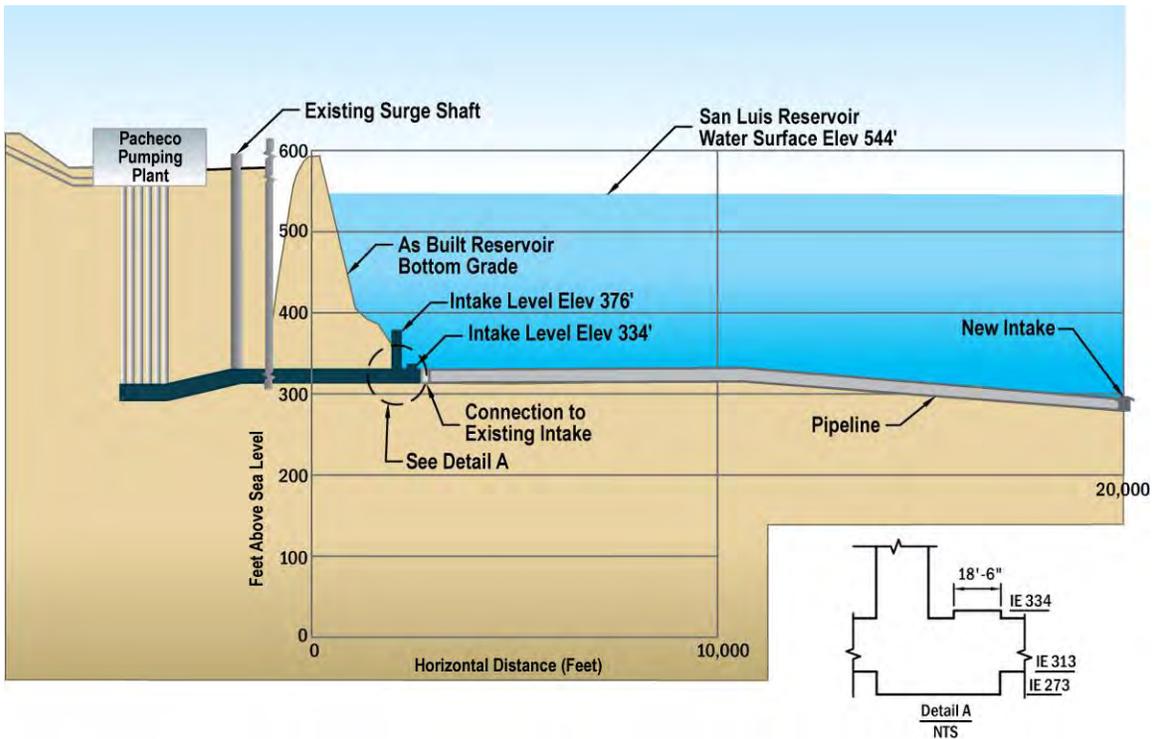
Lower San Felipe Intake Alternative Plan Pipeline Profile
